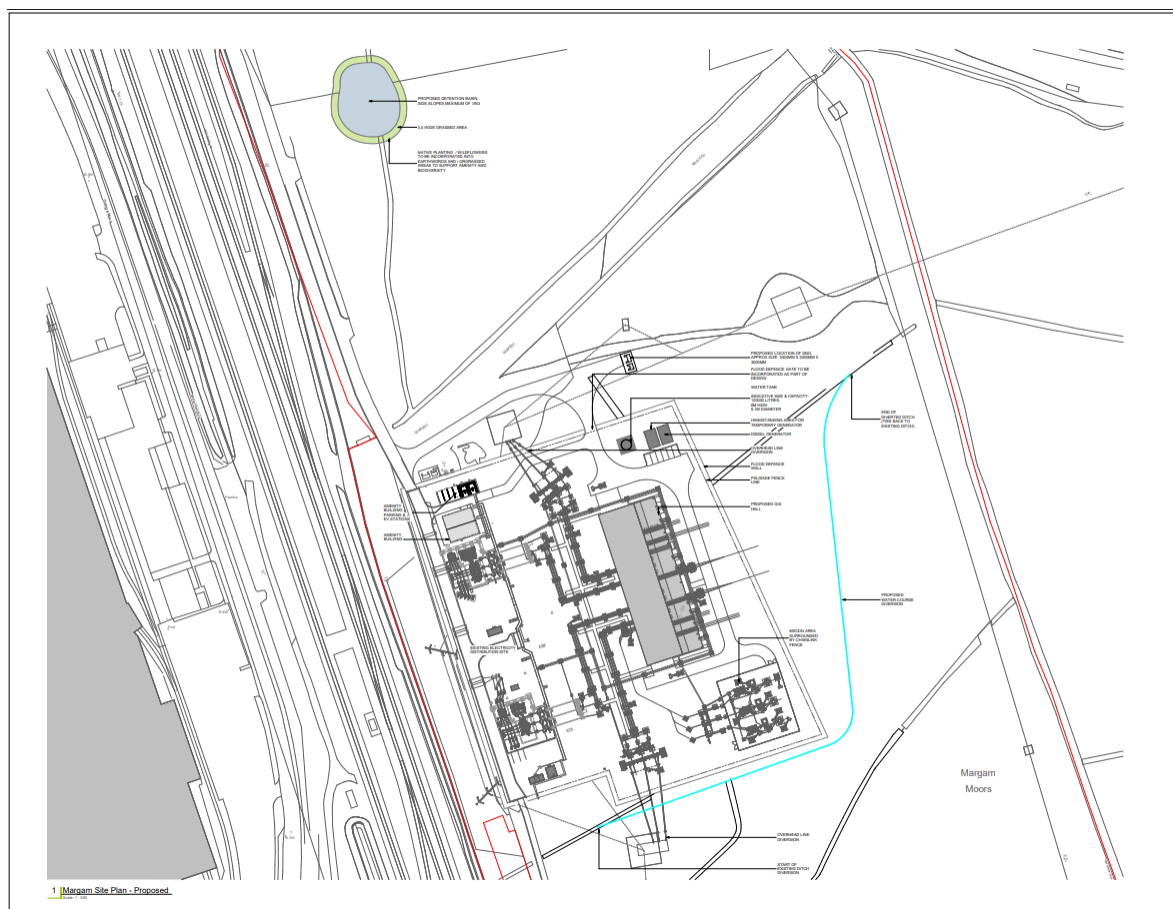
Proposed Site Layout Plan Showing Location of Internal Access Roads
